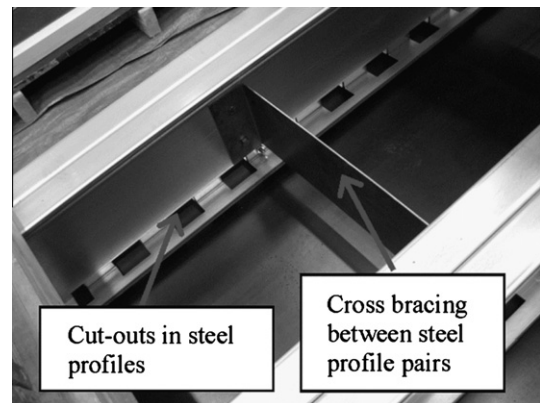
Cut-outs in the steel profiles and cross bracing between steel profile pairs before ECC was cast.
